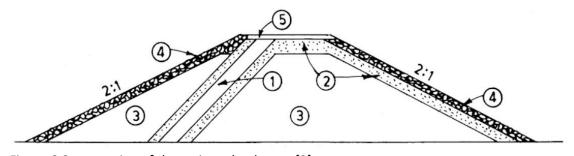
Cross section of the main embankment [3] 1 – Core; 2 – sand filter; 3 – sand and gravel; 4 – slope protection; 5 – gravel surfacing
